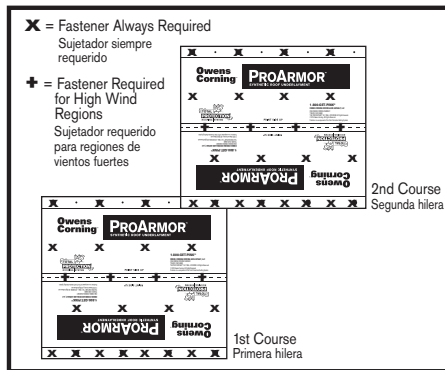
Fastening Locations for Slopes 2:12 to less than 4:12
